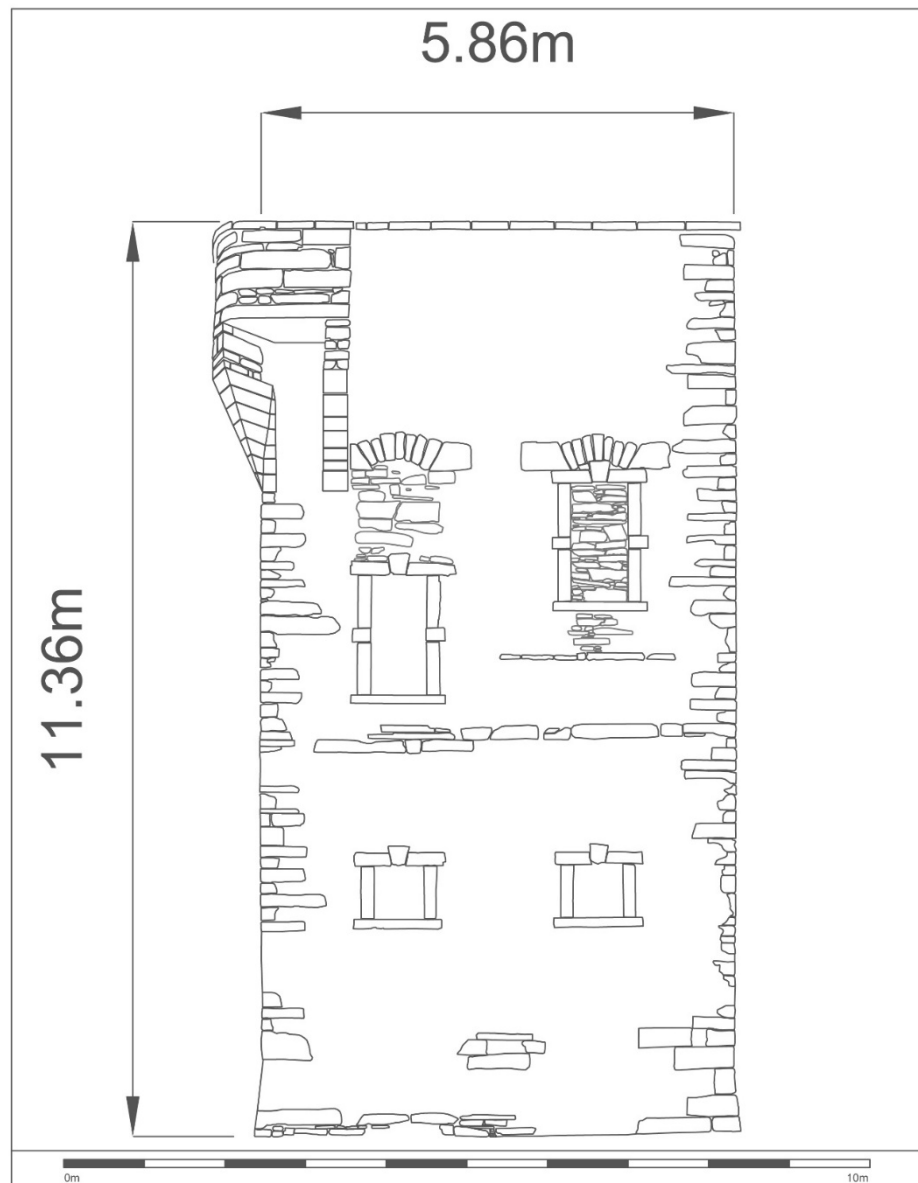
External elevation of the north-west wall of the signal tower at Malin Beg Signal Station.
